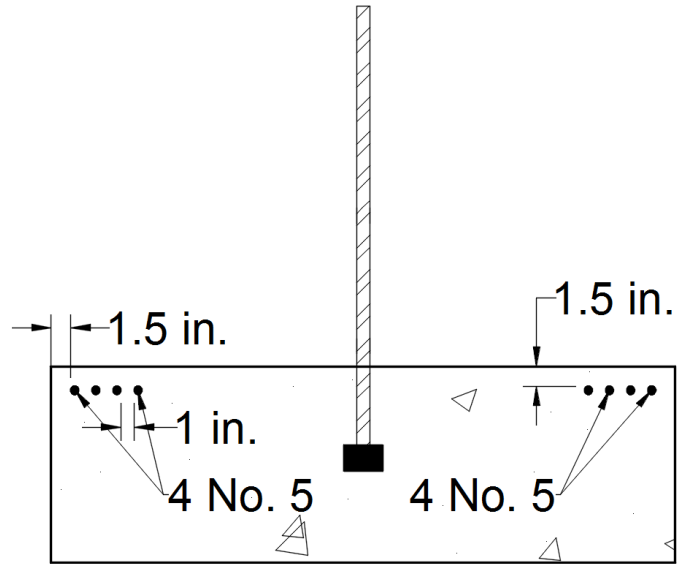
End view of shallow embedment specimen with 8 No. 5 bars as flexural reinforcement.
